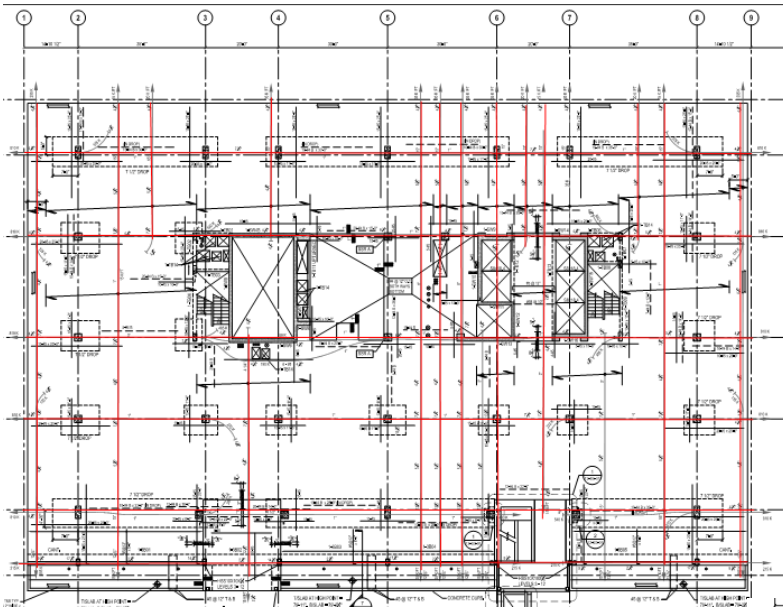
A typical floor plan with emphasis on the post tensioned cables.
